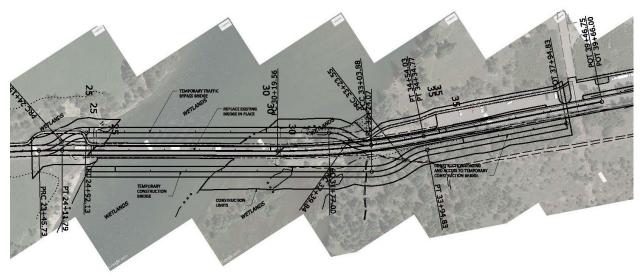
Alternative C "Reconstruct Fishing Bridge in Same Location"
